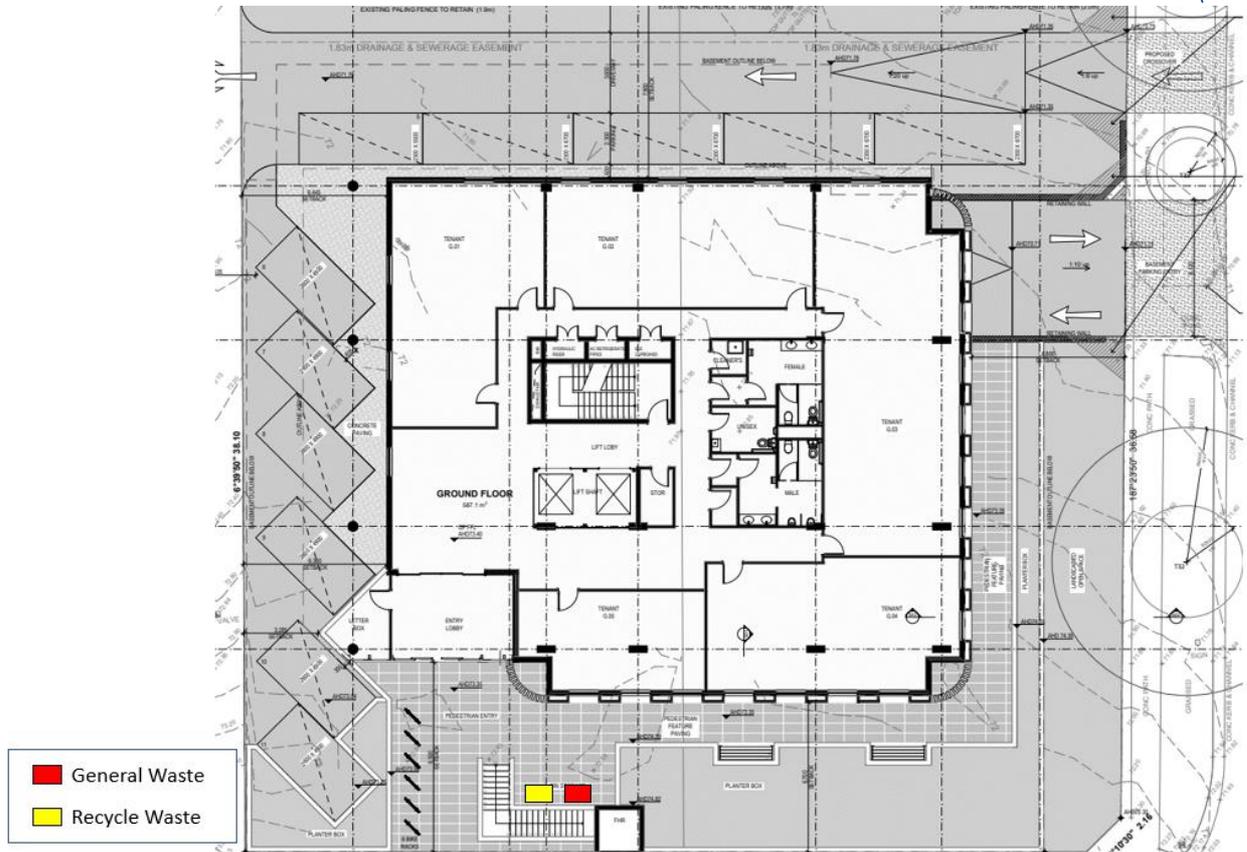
BIN STORAGE PLAN: GENERAL WASTE
